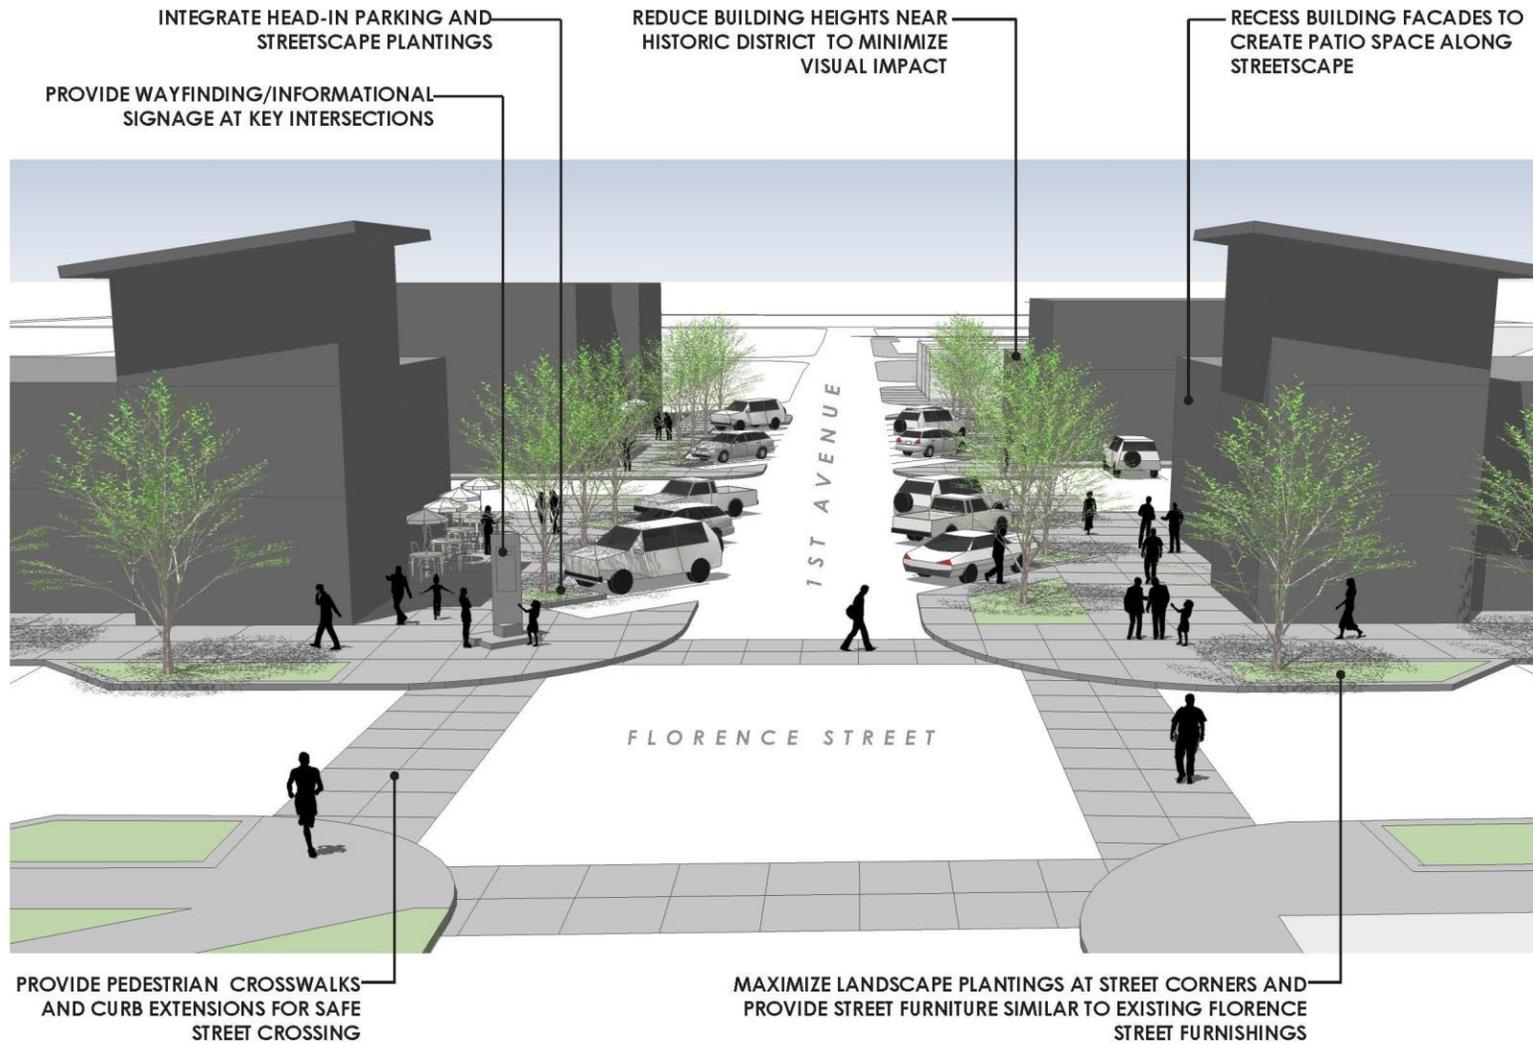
Florence Street & 1st Avenue Vignette: Detail of 1st Avenue
